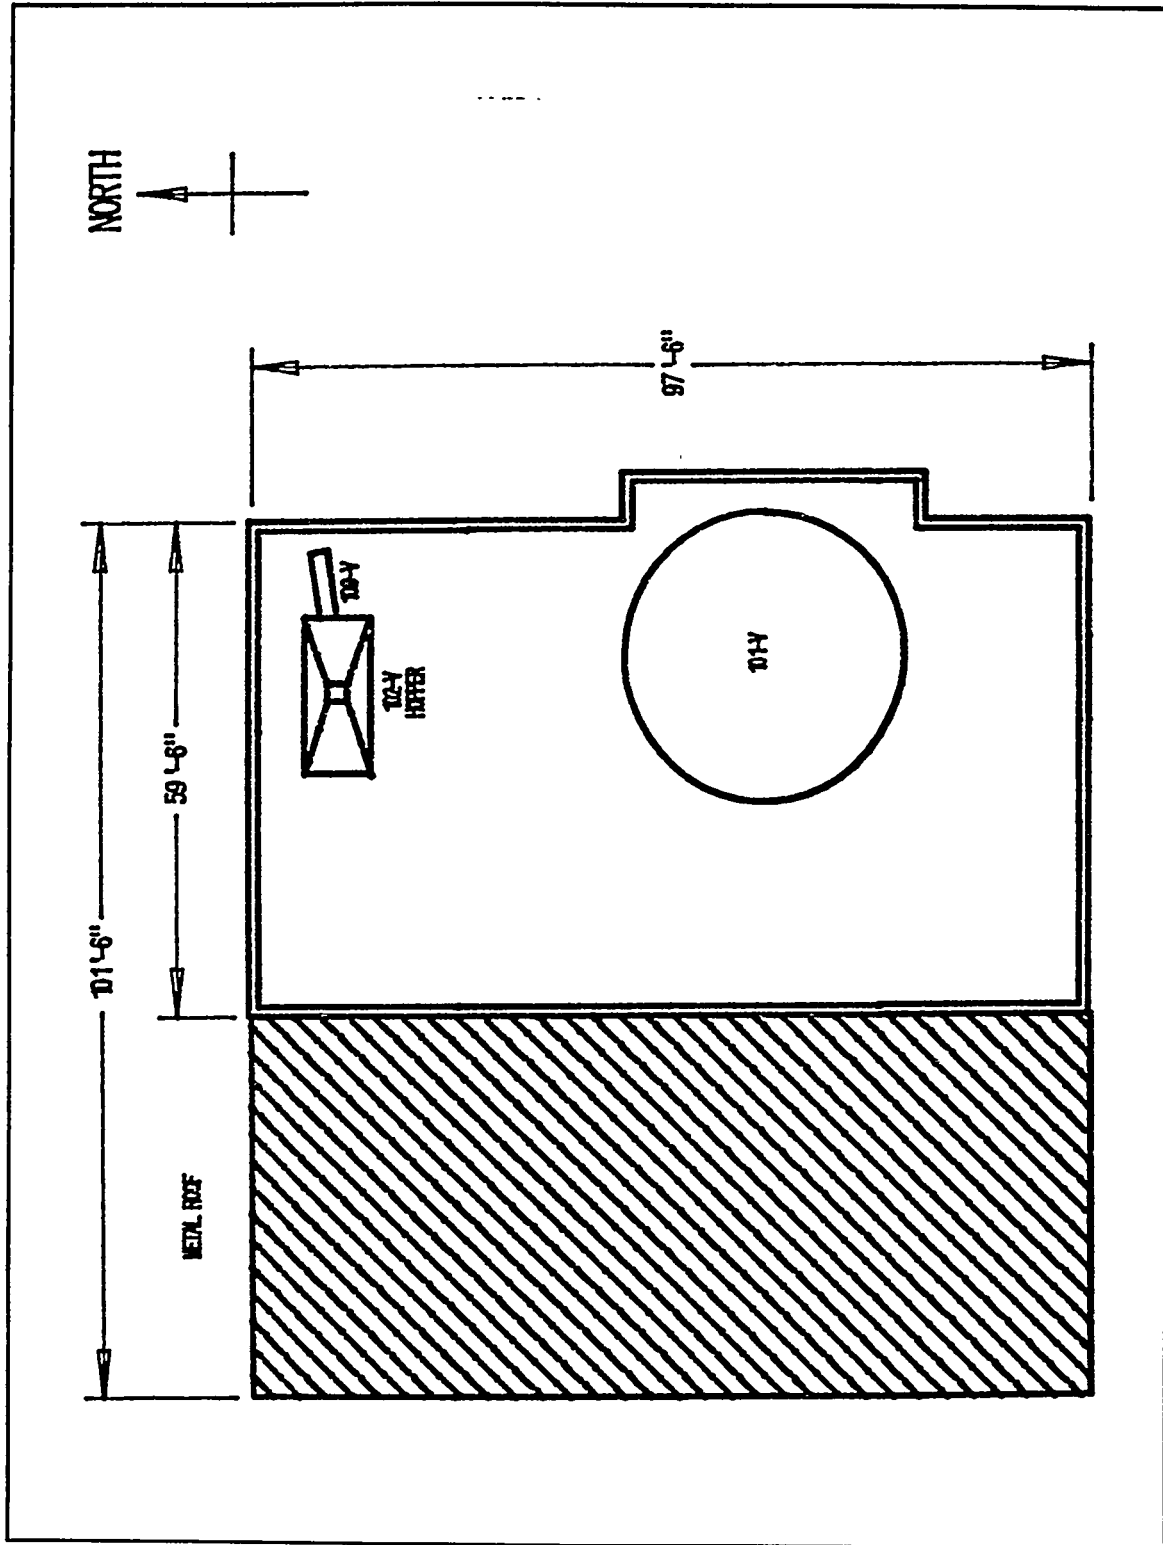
Floor Plan (Elevations 206'-3" to 225'-6")
